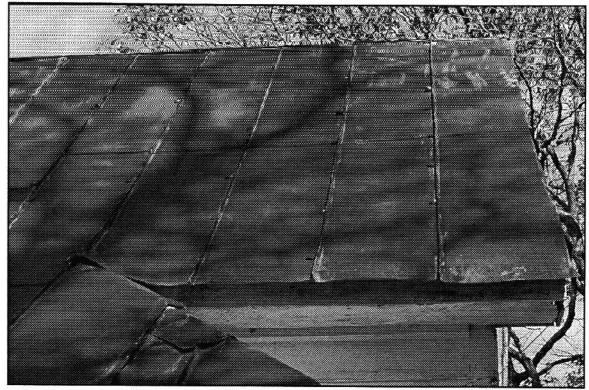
South slope at rear ell, note roof pans interlocked, not crimped and with exposed tabs.
